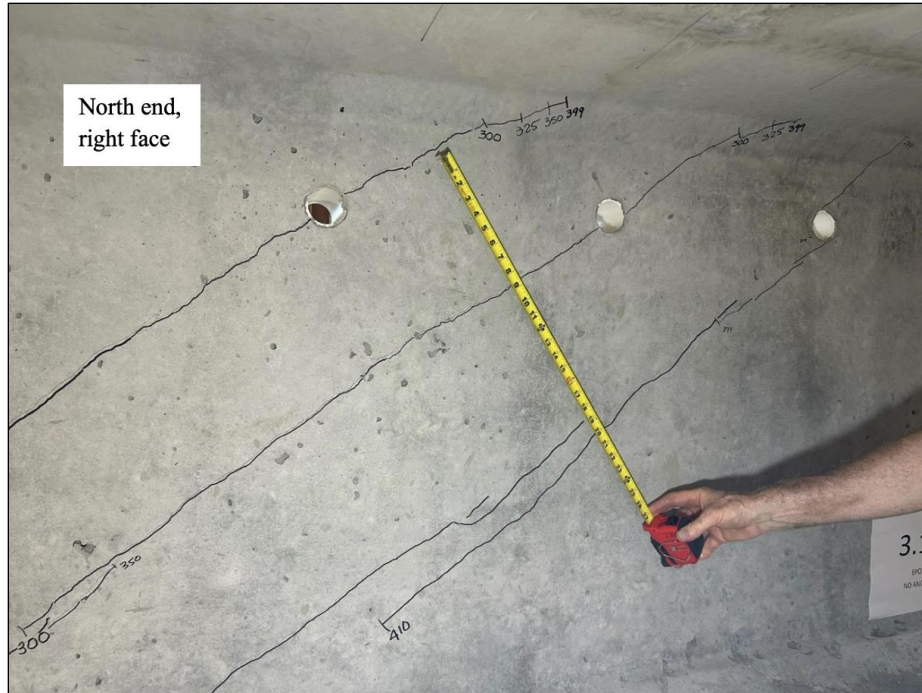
Photo. Test 3.1.S (repair 3.1RBF, 3.1LBF) shear cracks strut width at 410 kip (right face of girder pictured).
